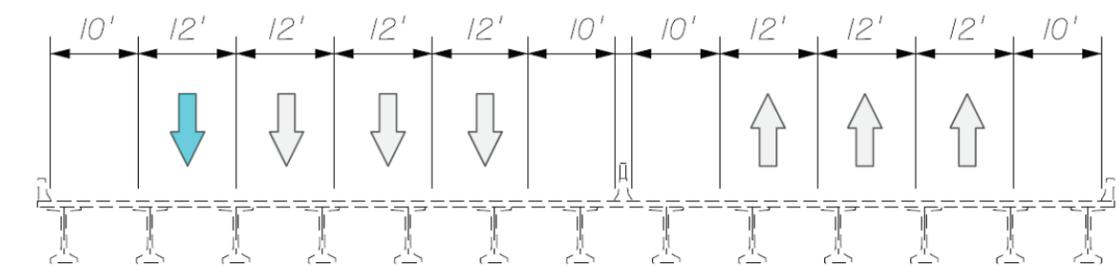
Existing Bridge Over SW 56th Street/Miller Drive
